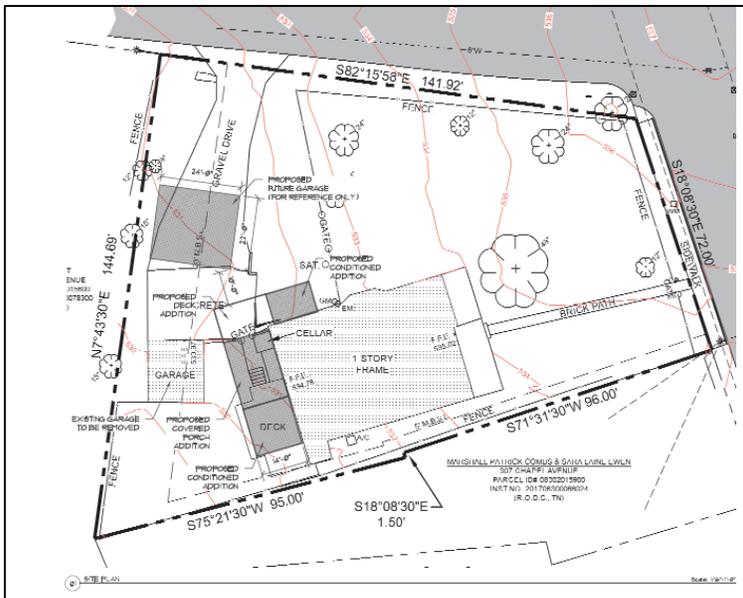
The outbuilding shown on the site plan represents a garage that could be built if this addition is approved.
